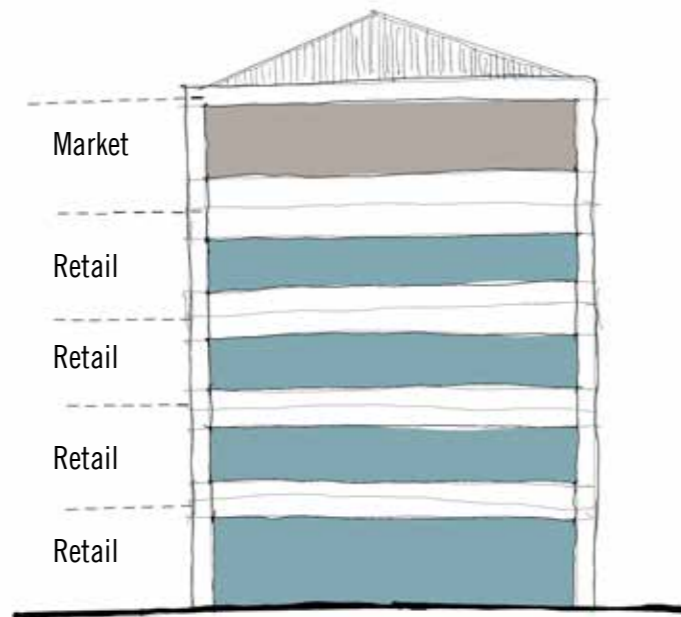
The Pacific Tower (Not to scale) (Author, 2023).
